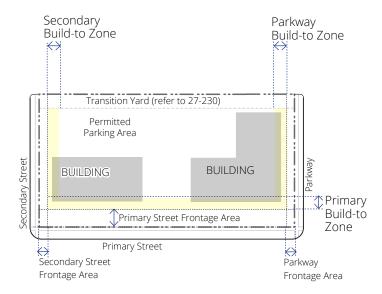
Corner and Build-to Zones on Different Street Types
